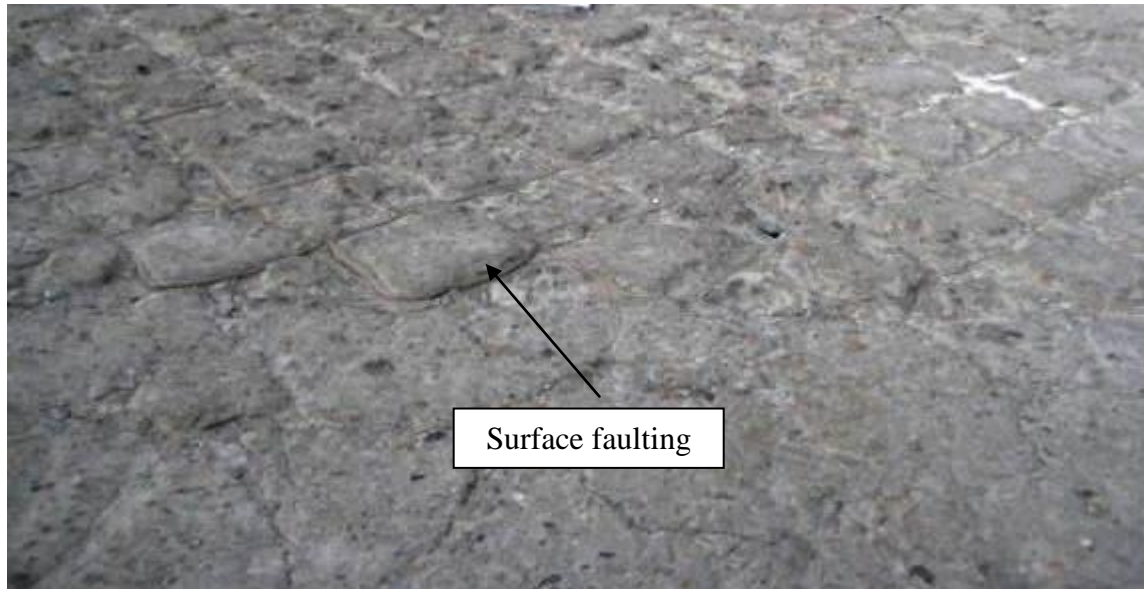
Surface faulting (100 mm thick PCCBP).
